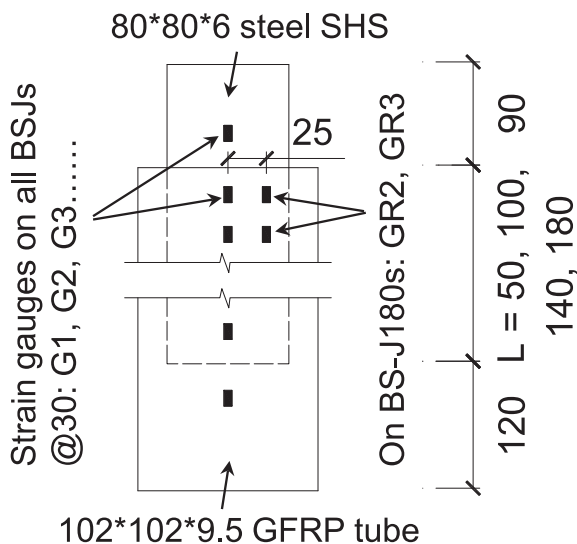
Geometries of bonded sleeve joint specimens BSJ-50 to 180 and positions of strain gauges (all units in mm).
